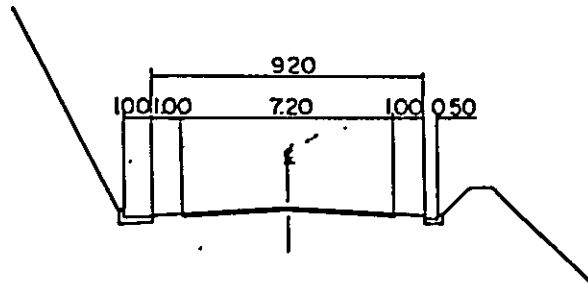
Typical Cross Section of Existing Road Page (2)
